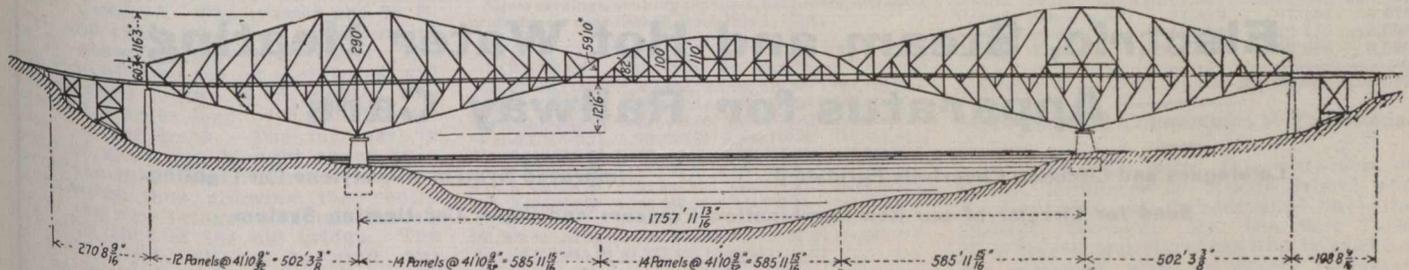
Unaccepted design C-Y of St. Lawrence Bridge Co. for Quebec bridge.
